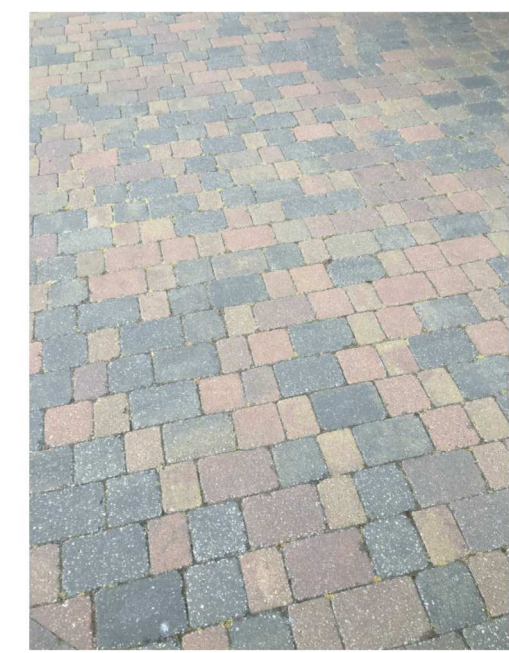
EXISTING SMALL CONCRETE BLOCK PAVING AT SOUTH STAND
